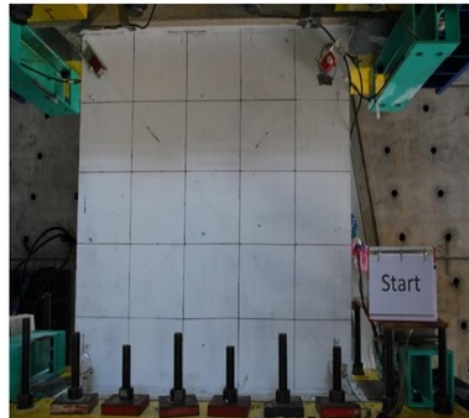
Test setup experiment test for the wall (Jyun-Jie Tsao, 2018)
